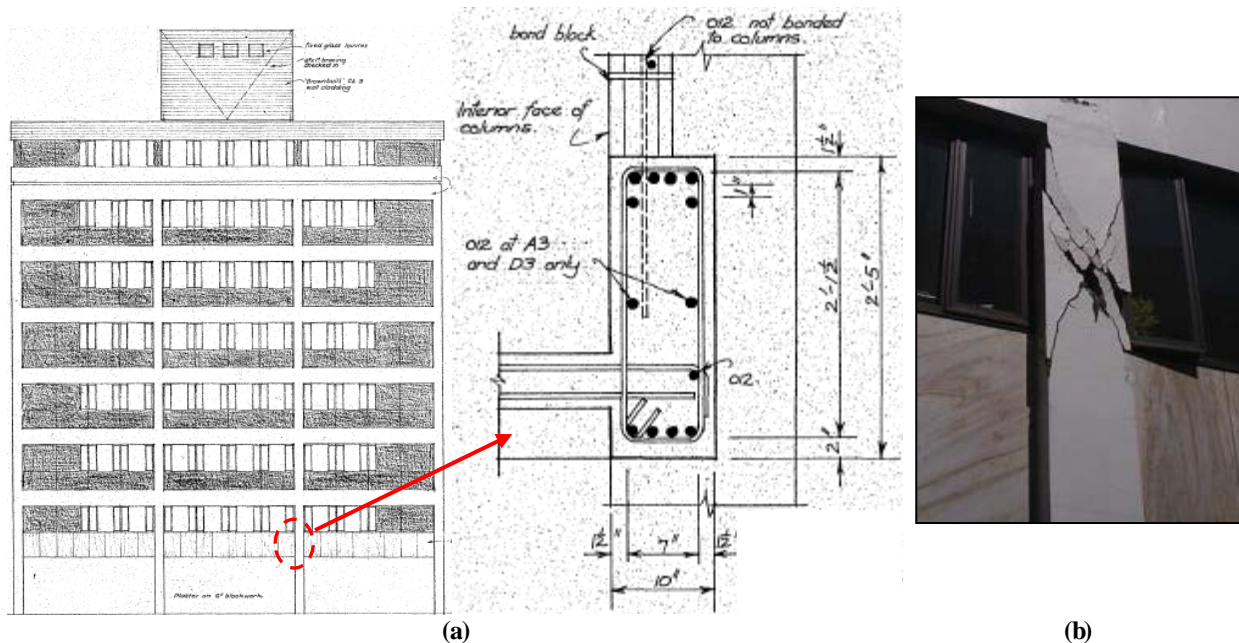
(a) Details of the spandrel beam at the building first floor; (b) severe shear cracks to first floor short column.
